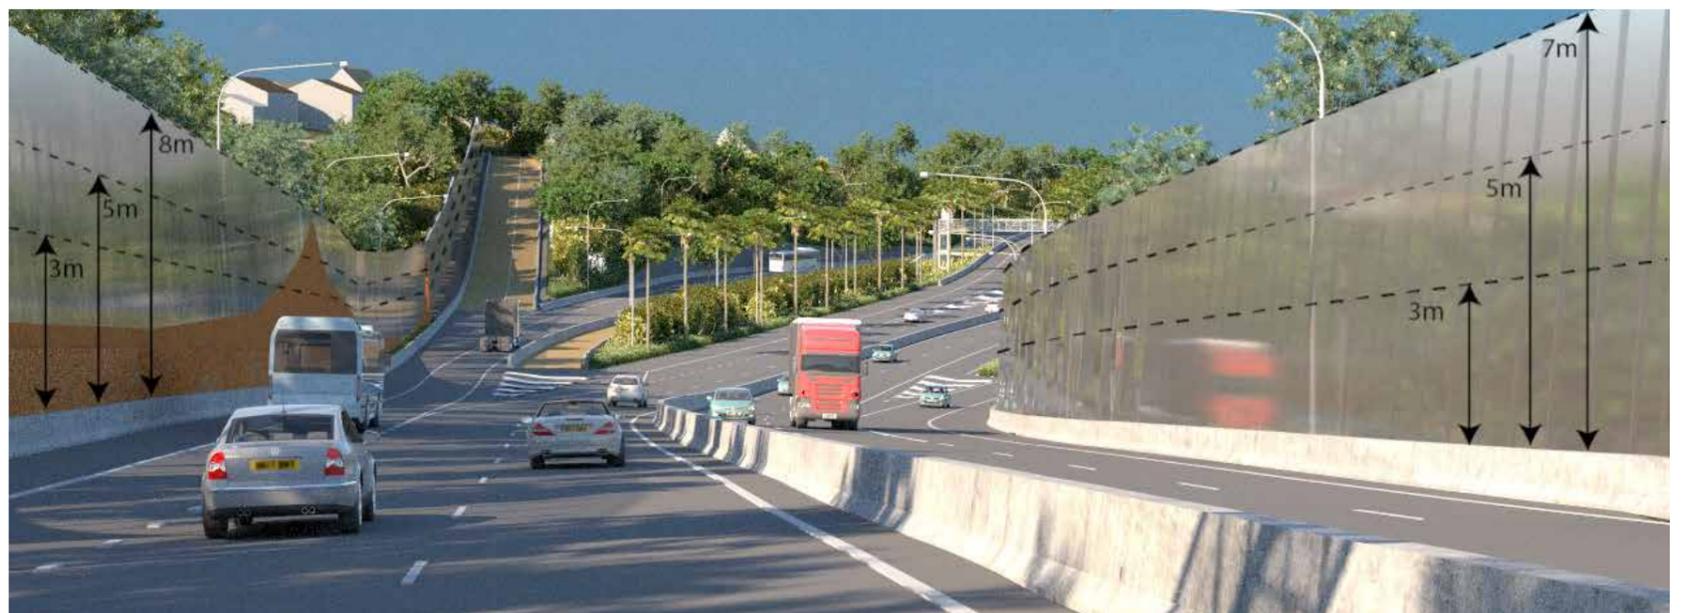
VP2 - Proposal showing the potential range of noise wall heights and mature planting at approximately 10 years after road opening
